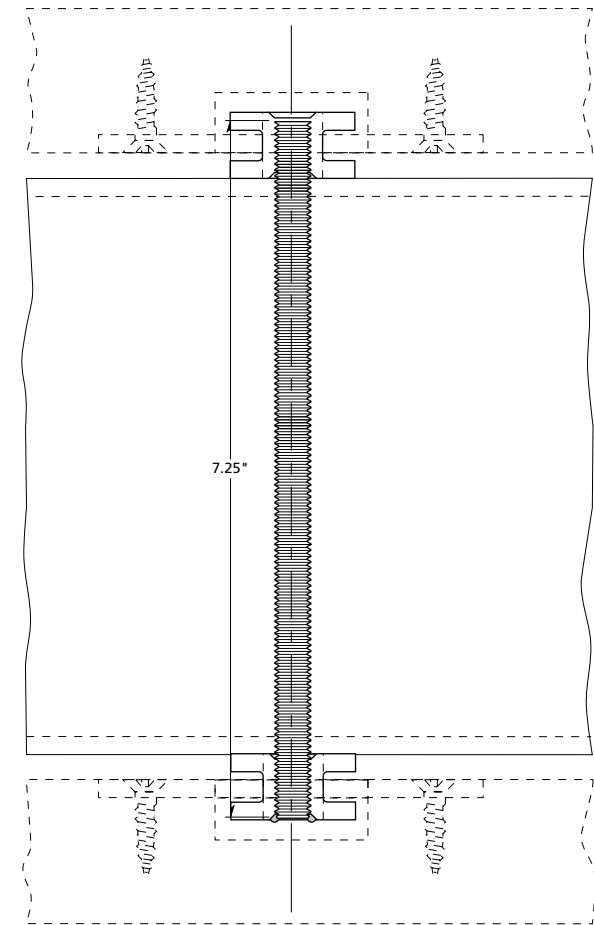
DETAIL POST ASSEMBLY 8 x 6 SIDE ELEVATION
